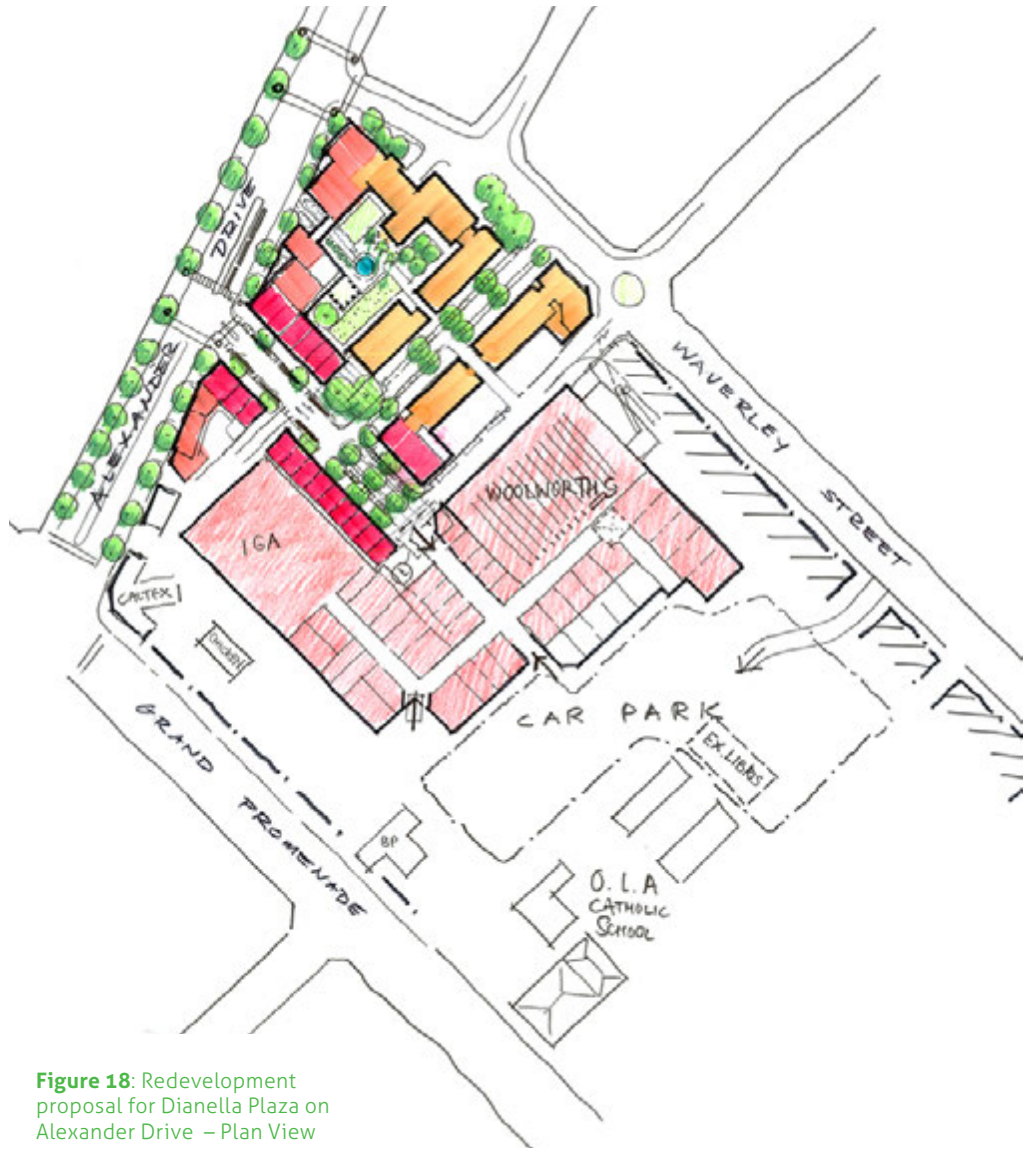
Redevelopment proposal for Dianella Plaza on Alexander Drive – Plan View
